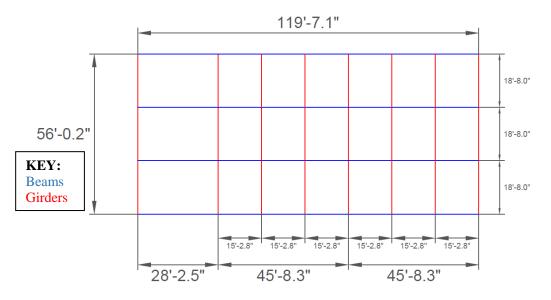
Plan View of Revised Design to Address Lateral-Torsional Buckling in Beams
